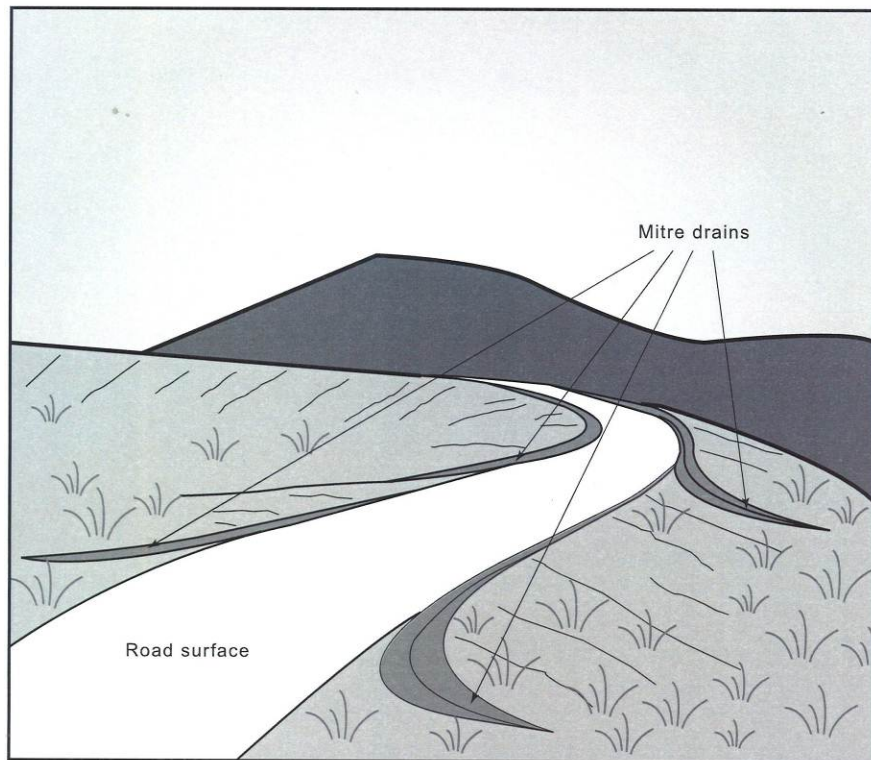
Typical layout of mitre drains on ridge top tracks (Source: Managing Urban Stormwater; Soils and Construction – Volume 2C Unsealed Roads)
